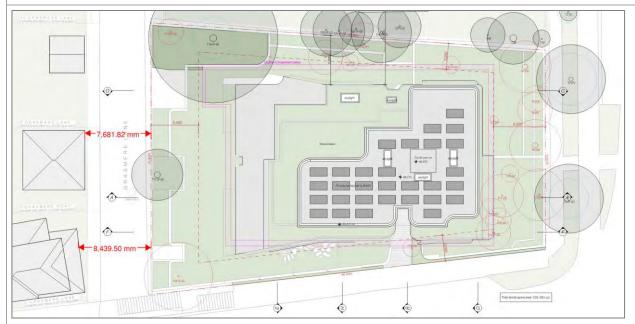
Extract of Site and Roof Plan, detailing the width of Grasmere Lane and the boundary-to-boundary setbacks of the properties north of Grasmere Lane in relation to the proposed development (Source: MHNDU)
